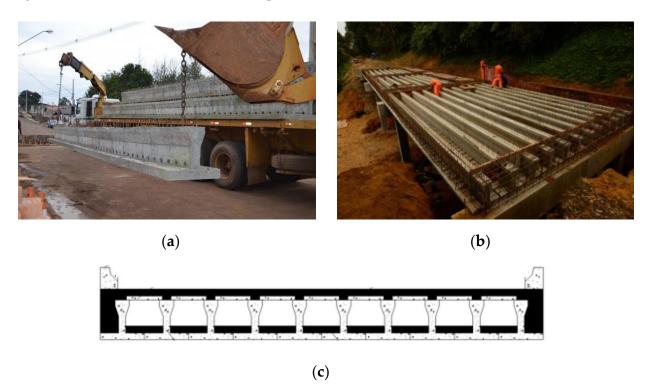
Precast concrete bridge: Isolated beam (a), assemblage (b), and transversal view (c).
